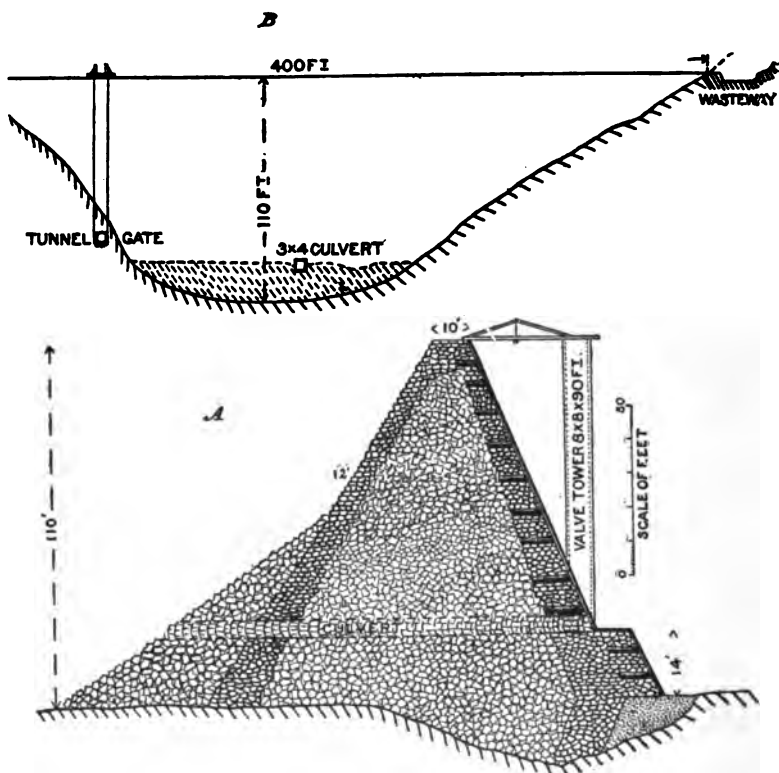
Elevation and Cross-section of Walnut Grove Dam.
